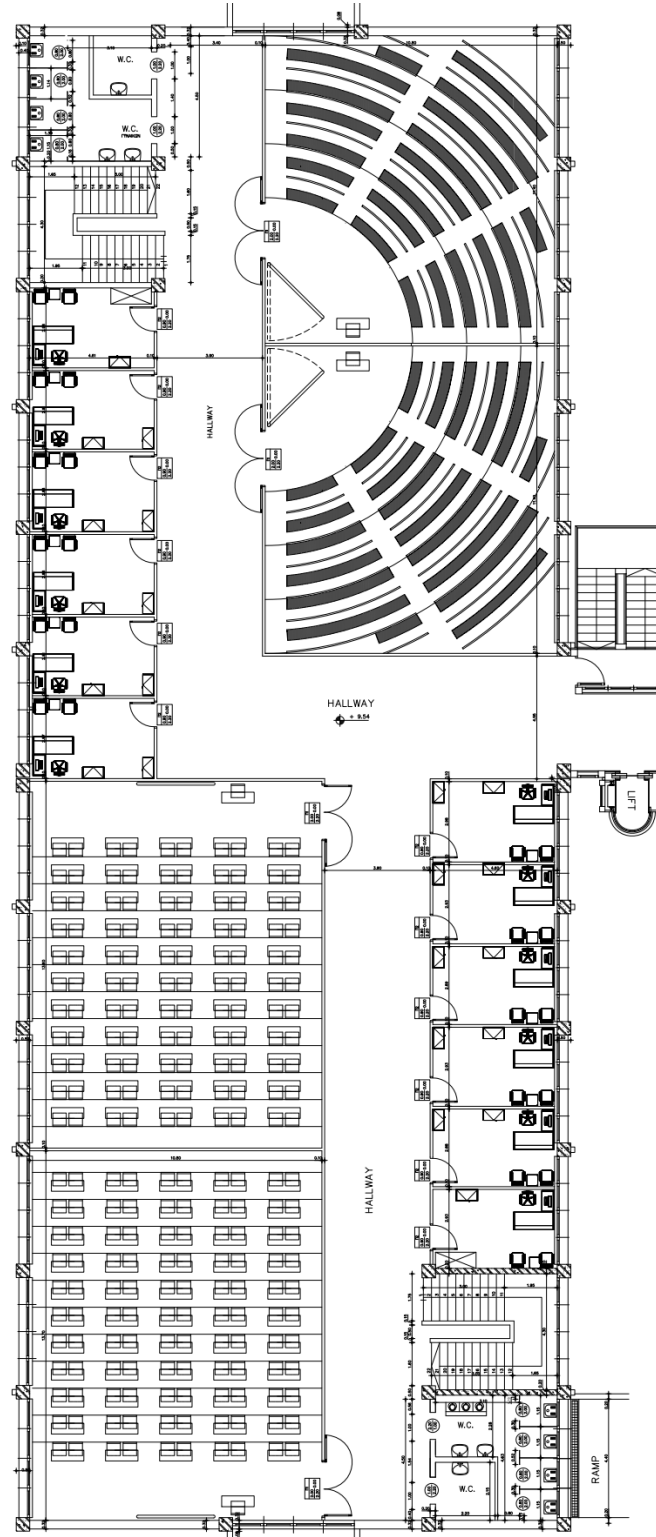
3rd floor of Building B (detailed plan of all building floors are included in the respective Deliverable).
